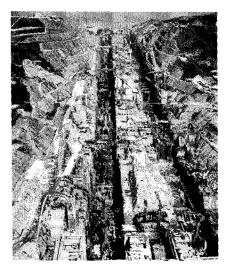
Site photograph illustrating the on-going construction of the permanent shiplock cut slopes
